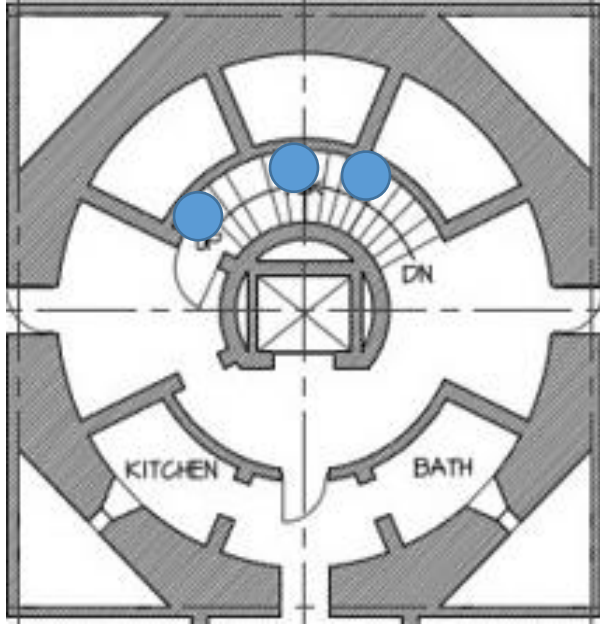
Blue dots shows efflorescence and other damages observed on the *Powell Street* mural located on the stairs from the first to the second floor.
